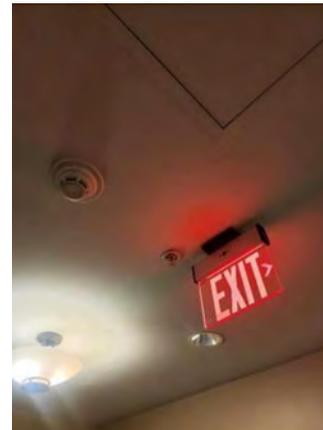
Path of egress exit sign with smoke detector and fire sprinkler head.
